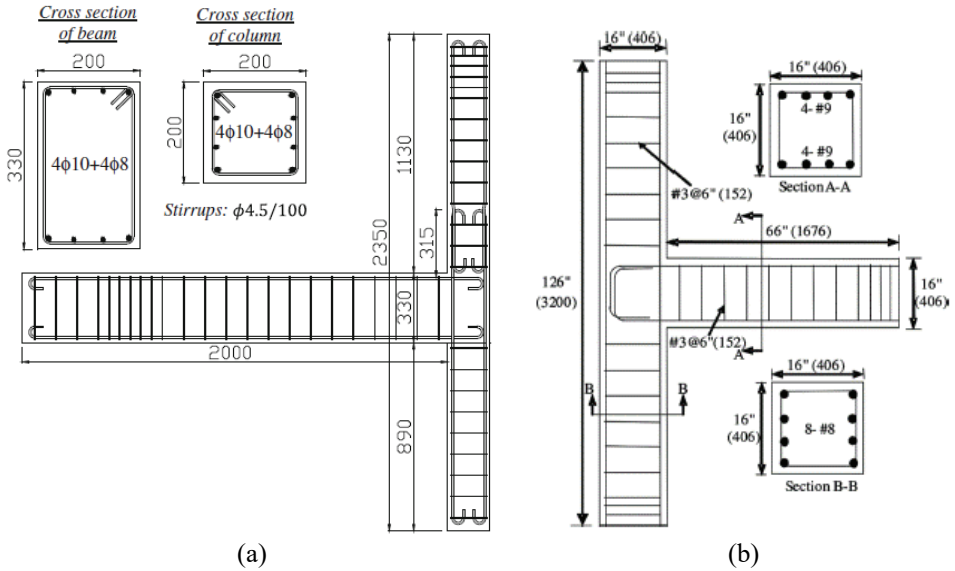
Geometry and reinforcing details of unreinforced beam- column joint for (a) S1 specimen tested by Mısır and Kahraman [32], and (b) Unit 4 tested by Pantelides et al. [33]
